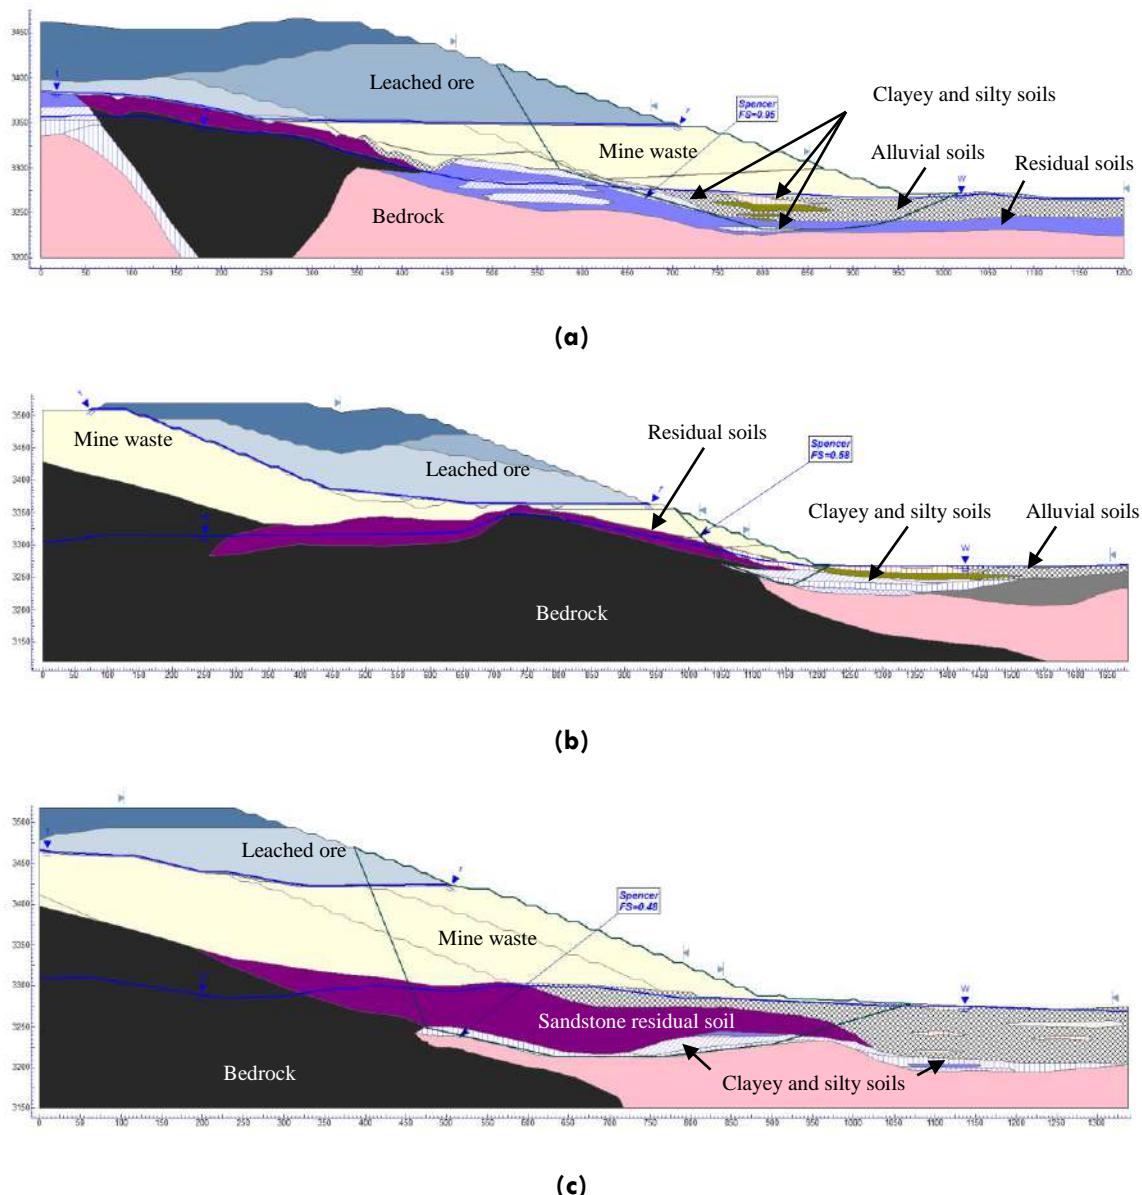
Cross-sections (a) 1-1', (b) 4-4' and (c) 6-6' and their failure surfaces
